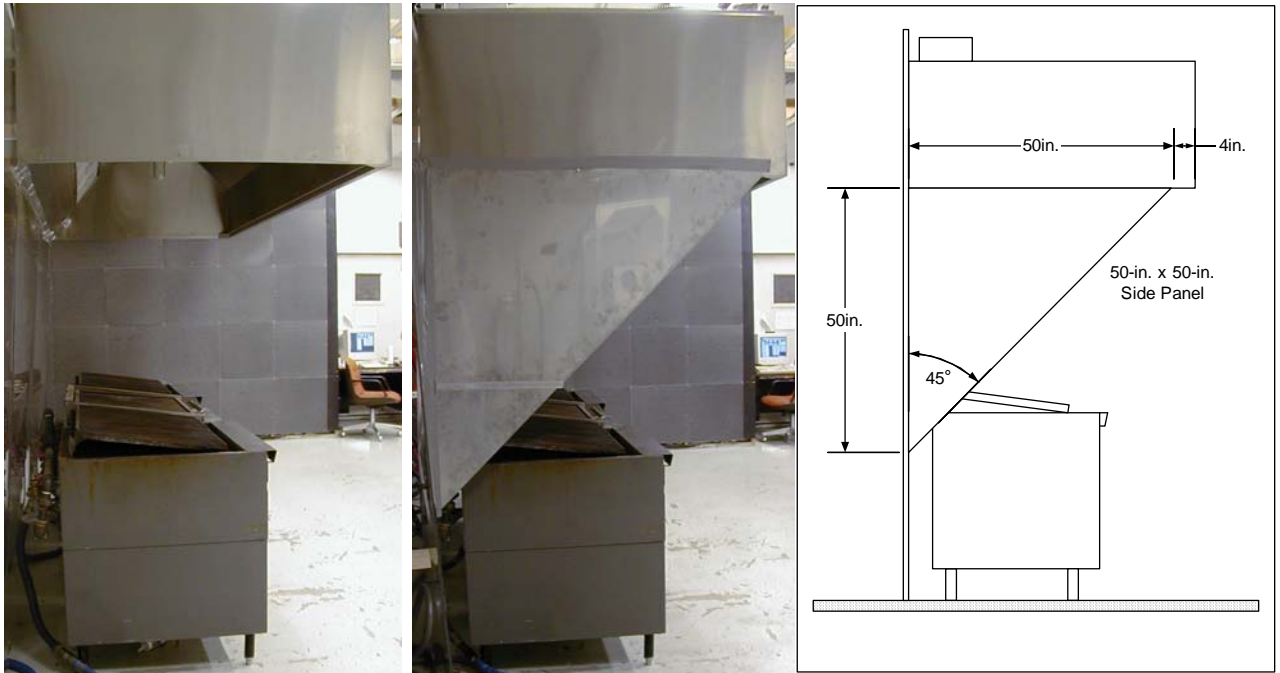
Side View with and without 50-inch x 50-inch Side Panel
